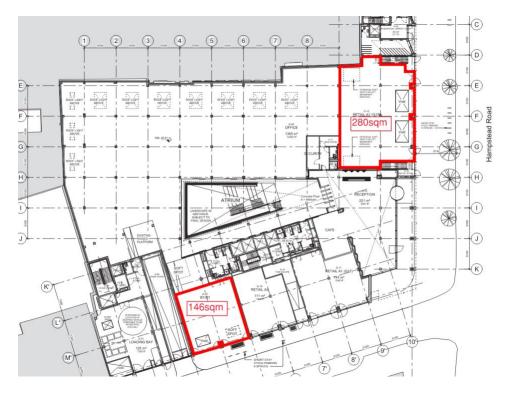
(above): Ground floor plan approved as part of 2022 permission showing the locations of the ground floor unit fronting Drummond Street and the ground floor unit on Hampstead Road. The area outlined in red as measuring 146 sq. m forms part of the current planning application.
